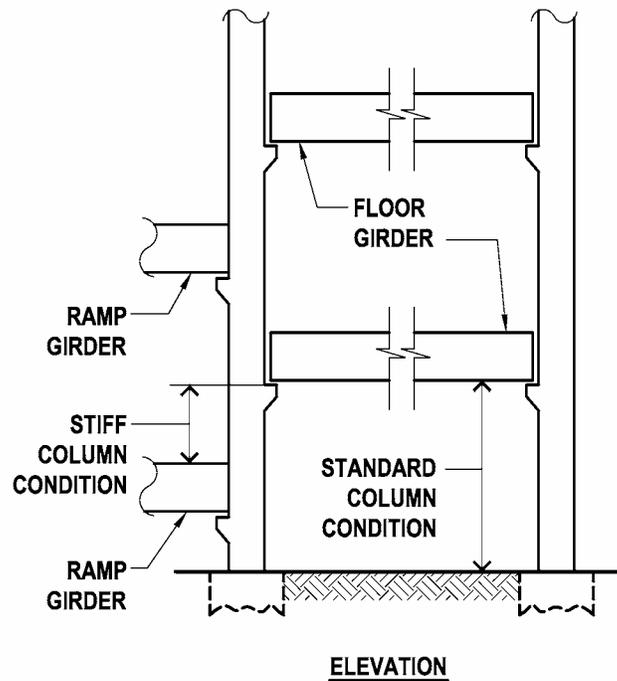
Accidental Reduction of Column Height at Ramp
